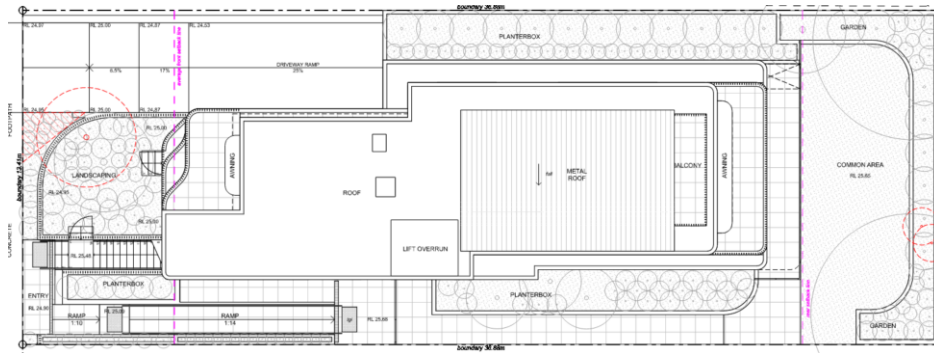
Proposed site/roof plan – 57 Hannan Street Maroubra (Source: Archispectrum)
